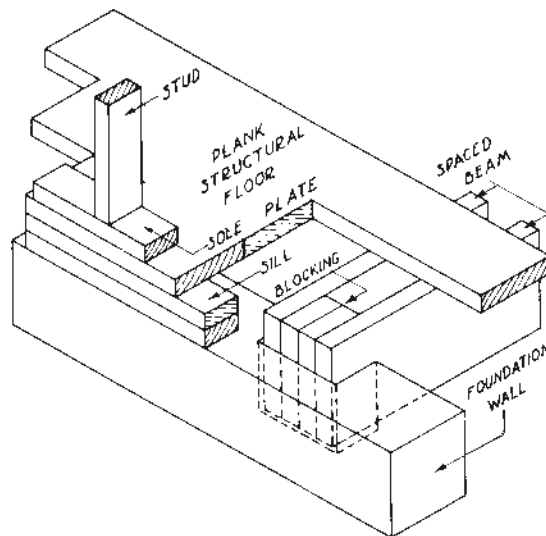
Plank-and-beam Framing Combined With Conventional Framing in Two-story House
